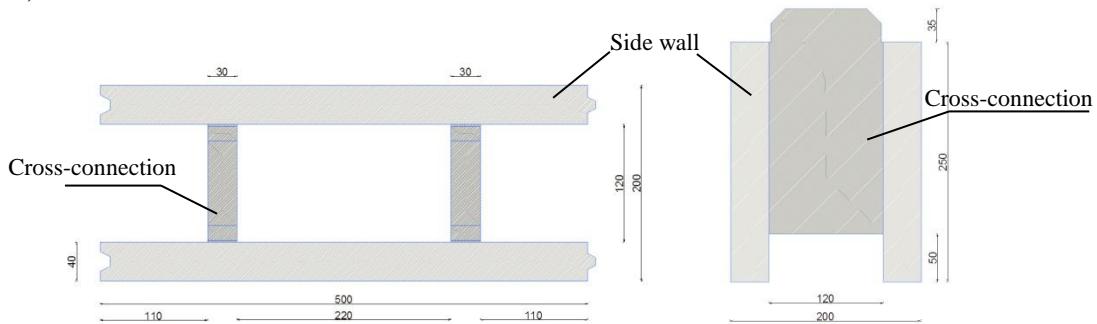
Plan view (left) and transverse section (right) of the modular concrete block.
